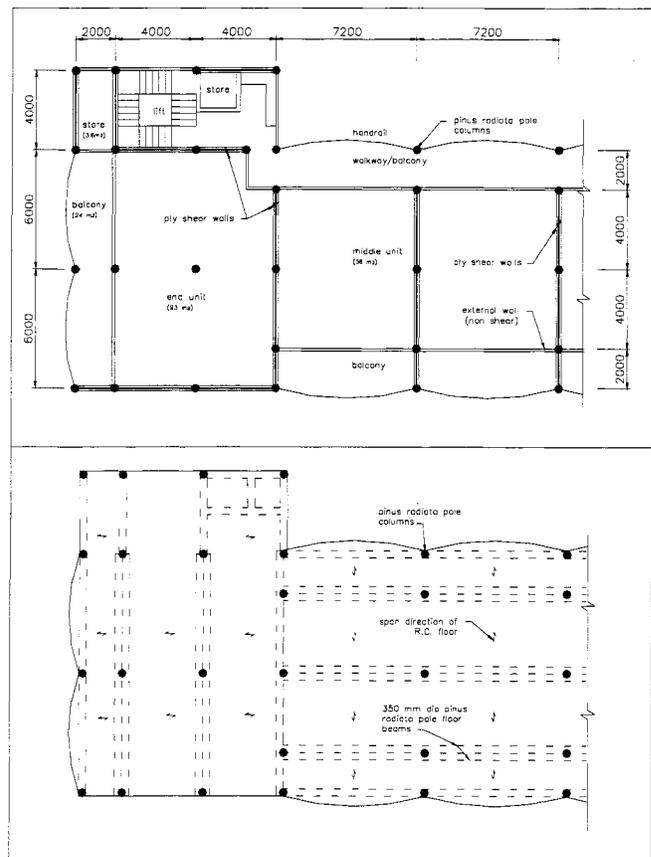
Prototype Pole Building - above, plan of units; below, plan of main structure.
